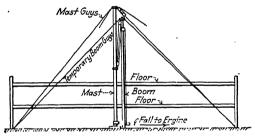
Elevating a guy derrick to higher floor. Lifting mast by boom.
